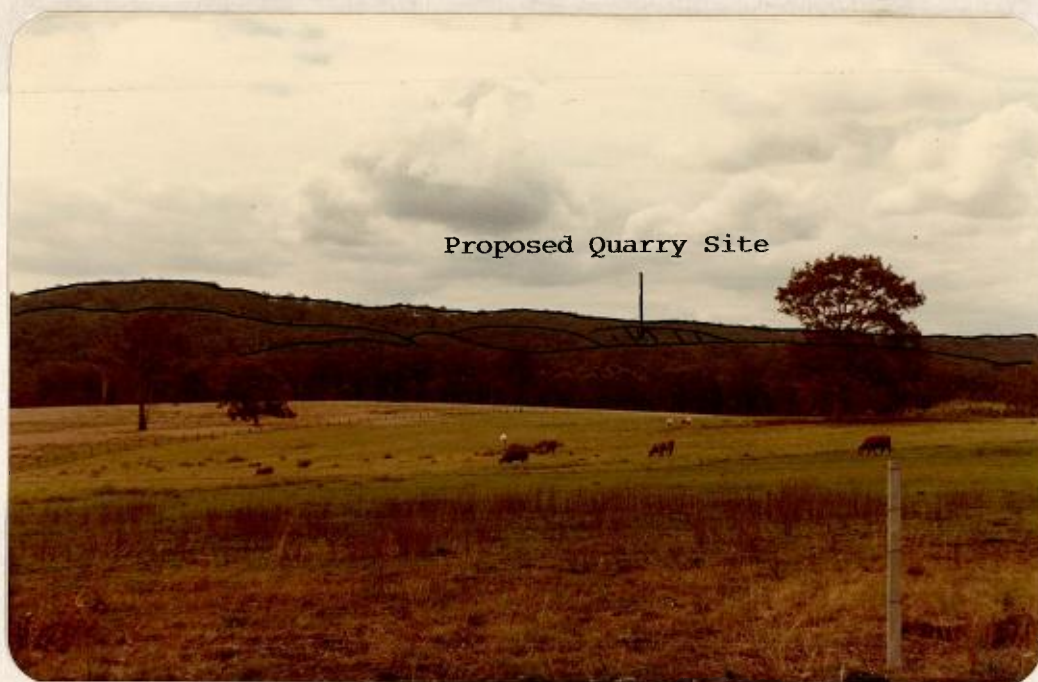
View of proposed quarry site from Seaham Road. The ridge in the middle of the plate will shield the plant site from the road and surrounding areas.
